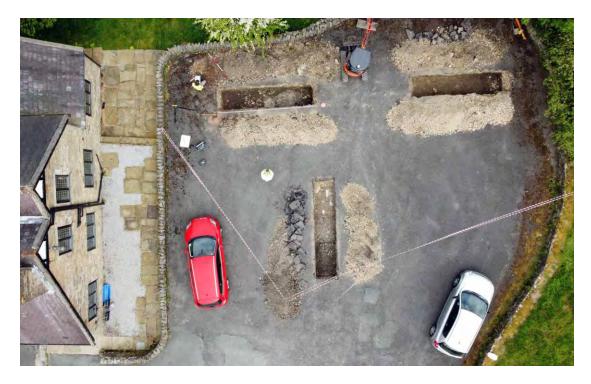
Site during trenching, viewed from above, farmhouse to left, north at top.
